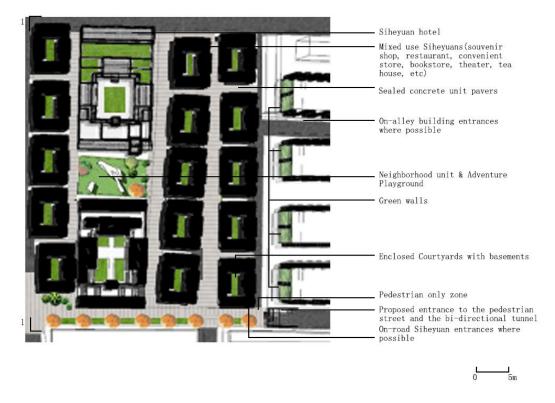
Illustrative plan showing the Yongning Road ancient architectural complex
